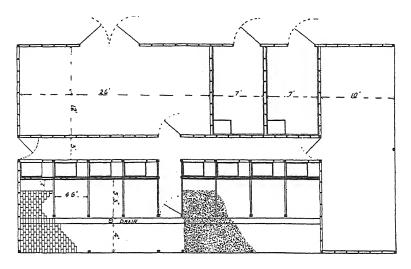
Ground Plan of an Eight-bail Milking Shed, Chaff House, and Implement Shed.
